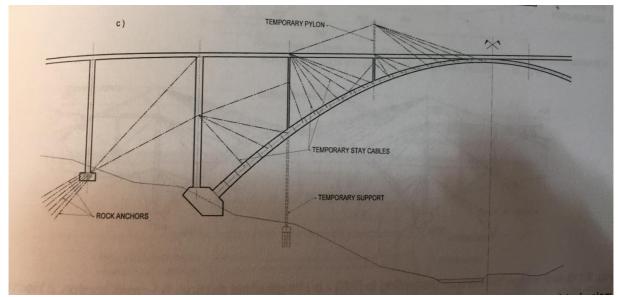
CONSTRUCTION TECHNOLOGY WITH TEMPORARY PILES AND STAYED CABLES
